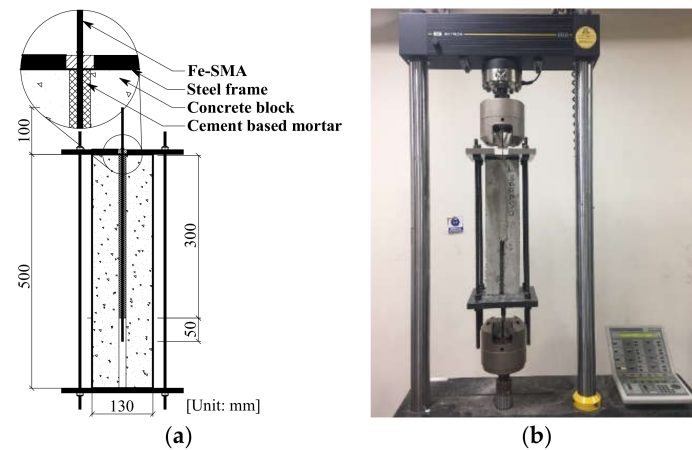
Bonding test setup: (a) Detailed of bonding test specimen; (b) Bonding test setup.
